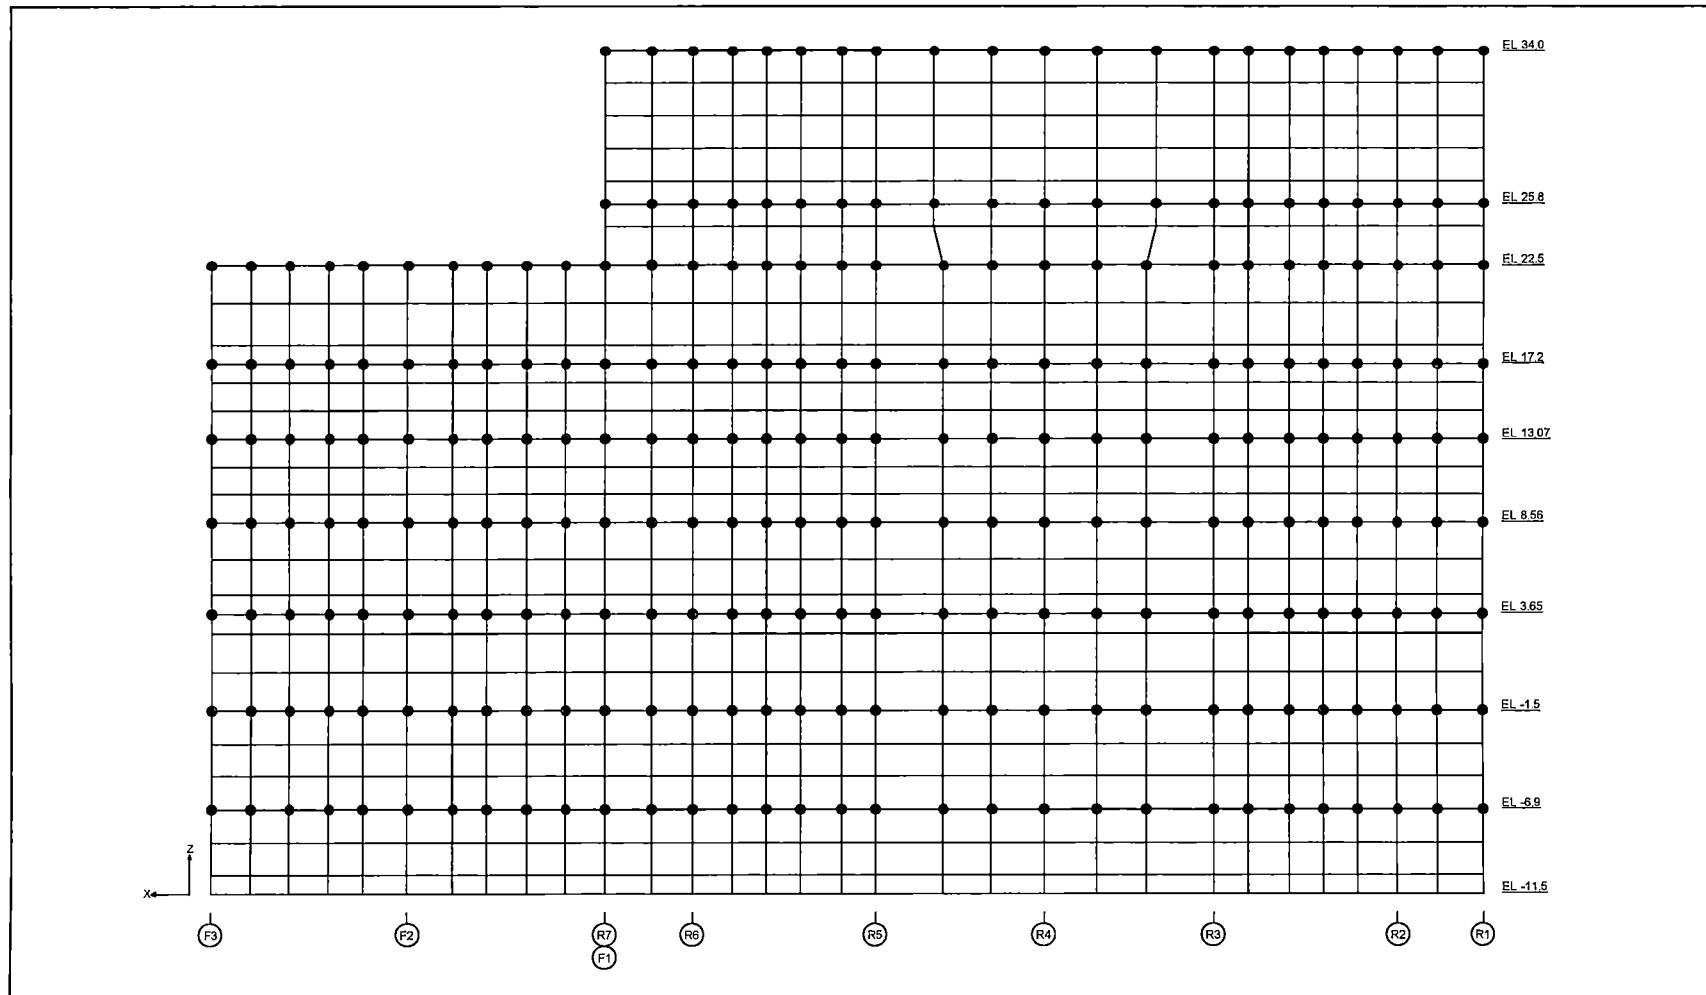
Application of Overturning Moments to the External Wall on RA Column Line
